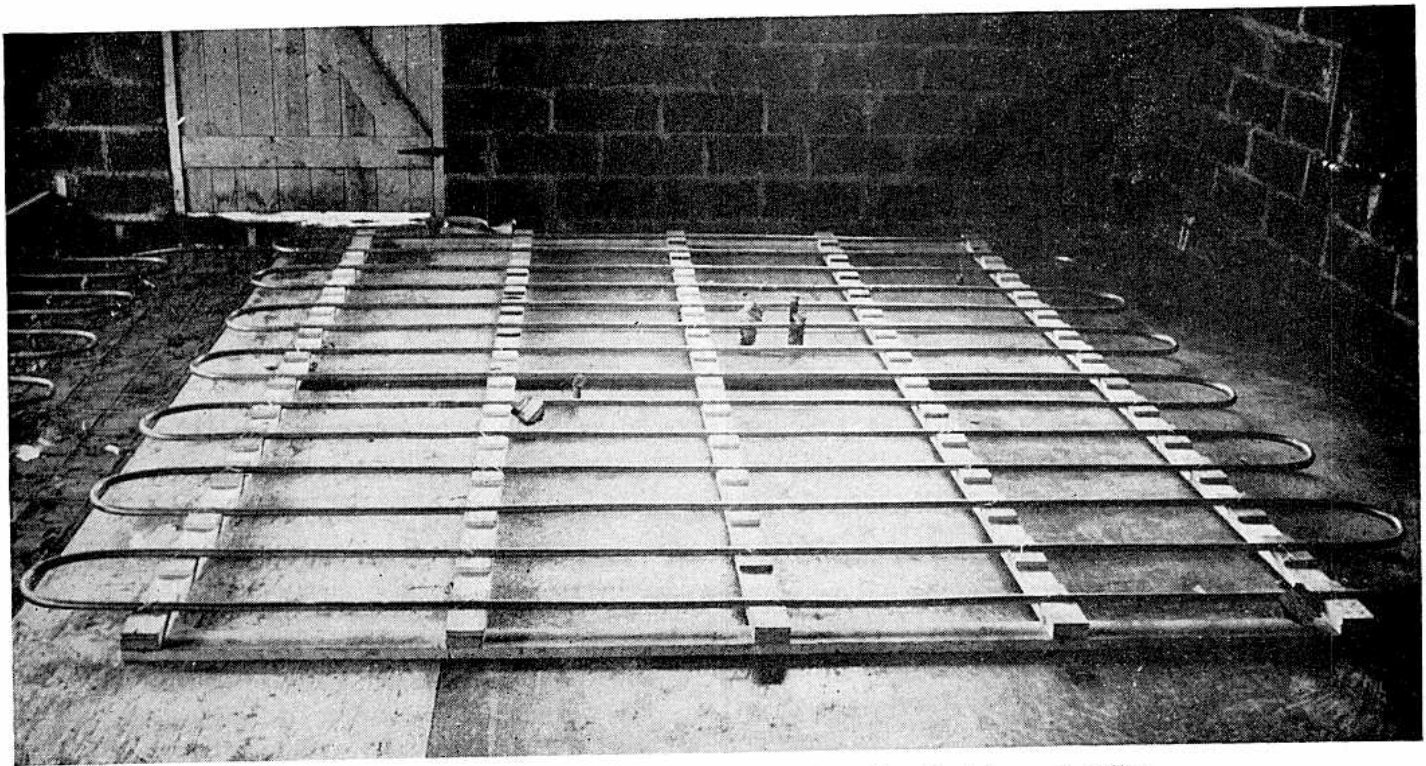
$\frac{3}{4}$ -in. copper tube on 9-in. centers temporarily wired to wood frame.
